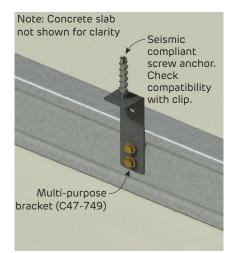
Multi-purpose BracketOption 1 Light Duty Connection
